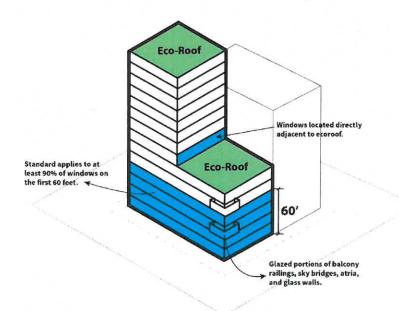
Building Floors that Require Treated Glazing Administrative Rule 5 Bird-Safe Windows List
